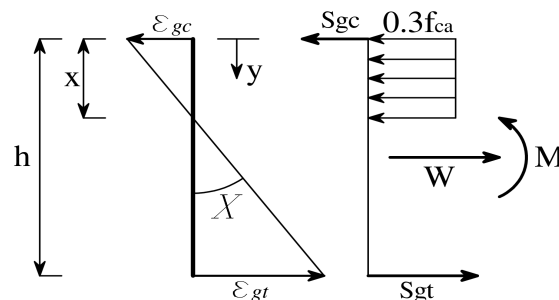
Strain, stress and forces in the cross-section of the wall assuming a rectangular stress block for adobe
